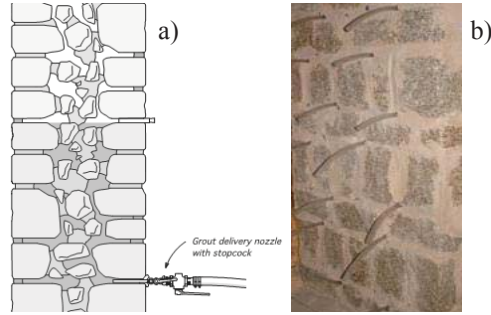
a) Example of a section of stone masonry wall core being grouted. b) Stone masonry with injection pipes.
